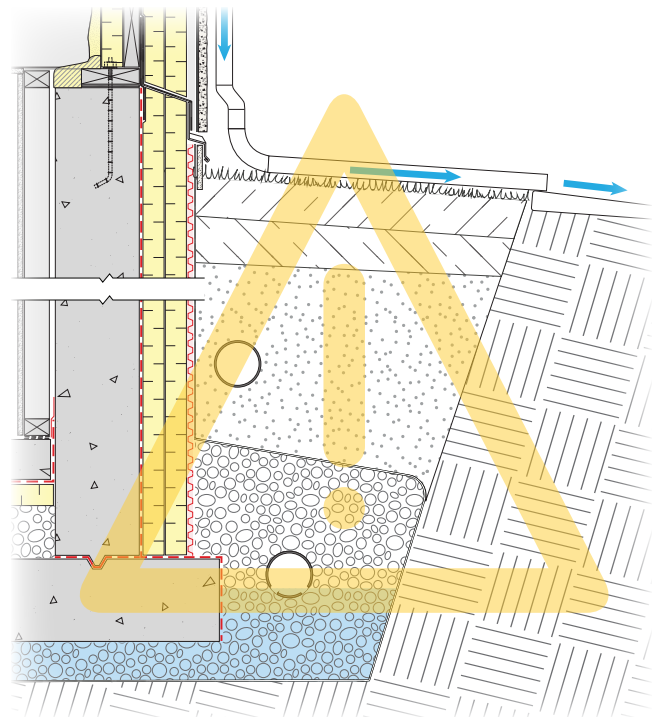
Schematic of an improved single pipe drainage system. The downspout is extended to discharge past the backfill zone. A shallow, solid pipe is shown to allow for future connection if drainage problems manifest. Refer to Figure 8.2 for best practice.
